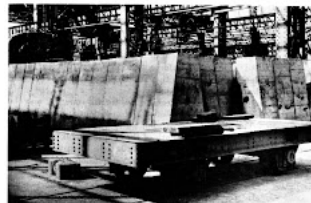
Present, reinforced-concrete blast walls (0.85 mile from ground zero at Nagasaki).
